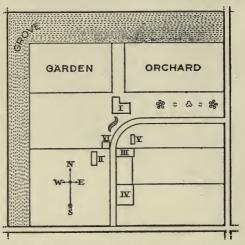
General plan for a farmstead, with road on the north; with windbreak, orchard and gardens; and with buildings. lanes and paddocks or small fields handly arranged beside each barn: I, house; II, horse barn; III, poultry house; IV, cow barn. The south half of the small field beside the horse barn could be used for swine with a building near the central lane, with such division into lots as may be required for the horses and hogs.
